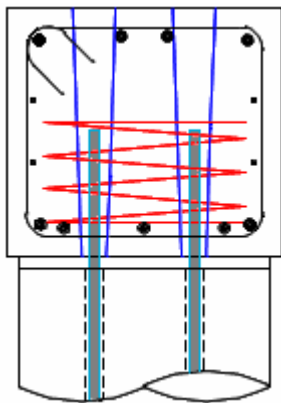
Red Fish Bay Project Precast Bent Caps
